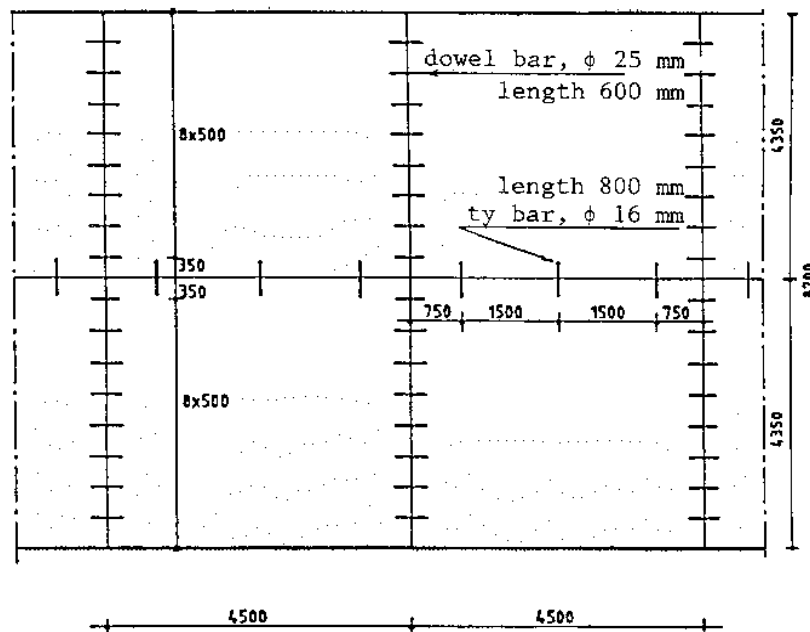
Concrete slab configuration, with dowel bars and ty bars, of a two-lane industrial road.
